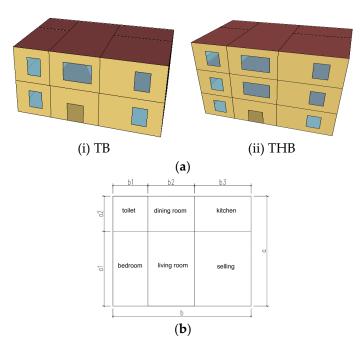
Building model and floor plan. (a) Volumetric model in 3D; (b) Floor plan.
